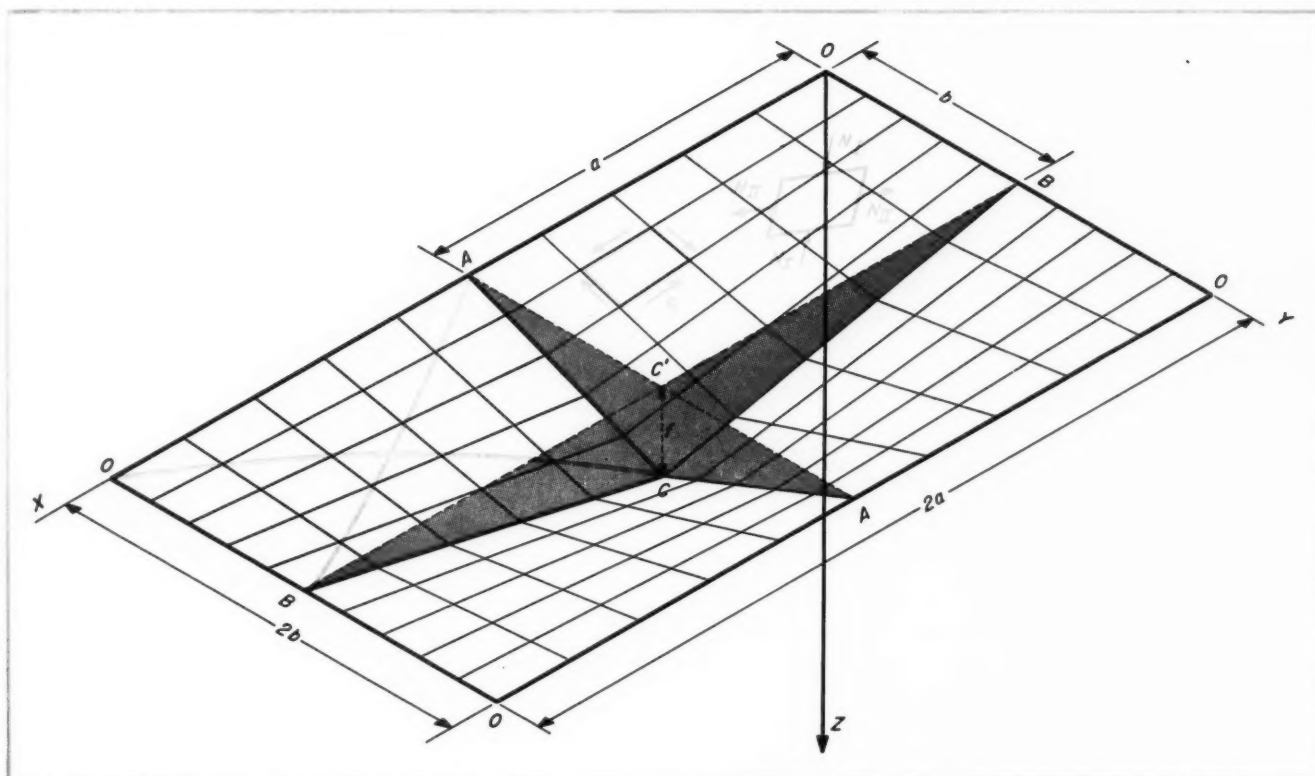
TO CONSTRUCT UMBRELLA SECTION GEOMETRICALLY, DROP CENTER C' OF A SIMPLE RECTANGLE A DISTANCE f TO A NEW CENTER C . THEN JOIN SIDES OF THIS WARPED QUADRILATERAL WITH A GRID, AS SHOWN.
